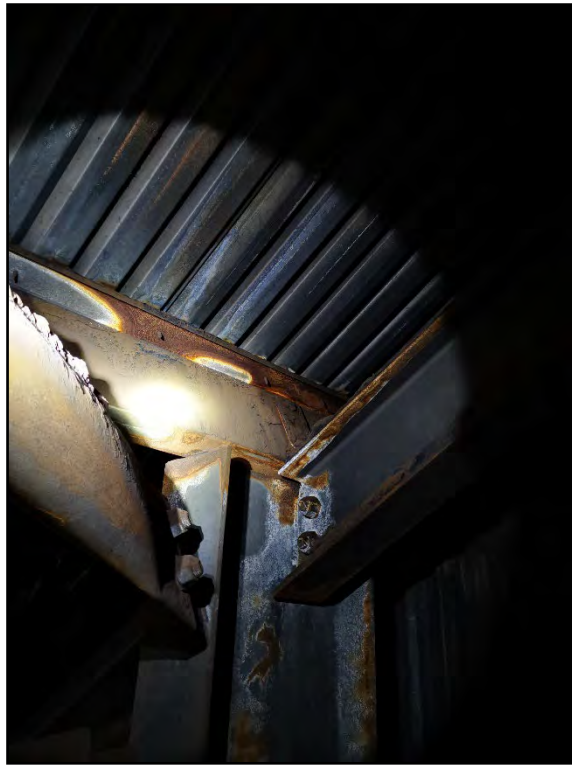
Door Frame Beam Showing Signs of Corrosion
